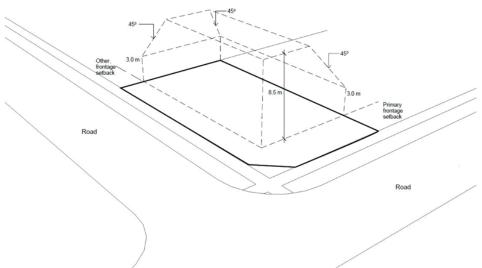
Building envelope for corner lots as required by clause 10.4.2 A3(a)
